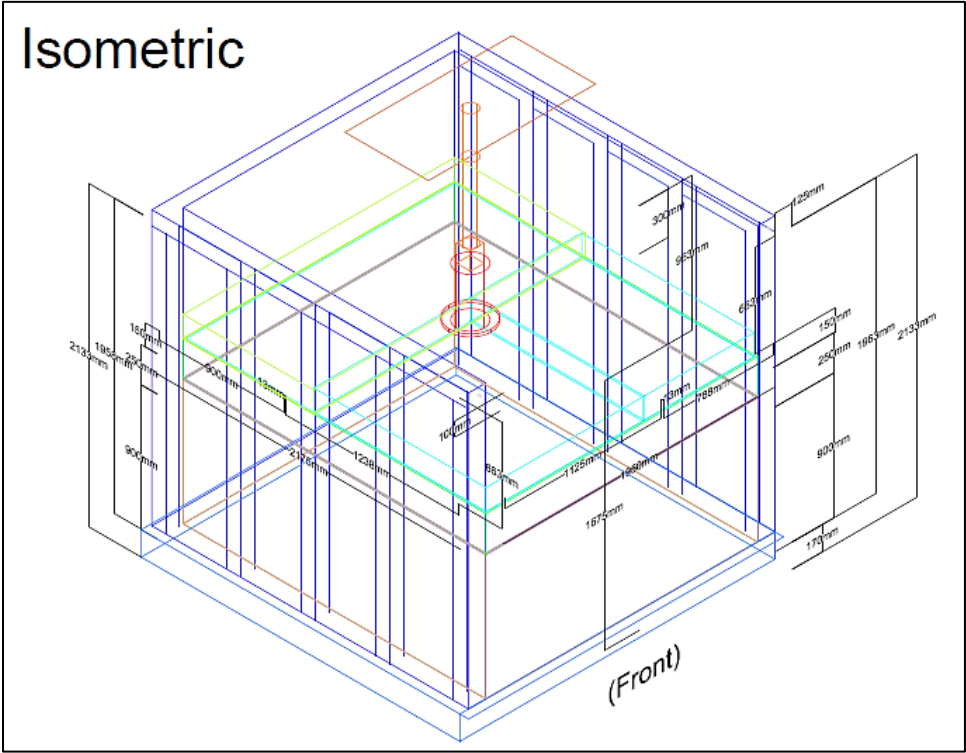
Big Box Layout with Concrete Slabs, Isometric View.
